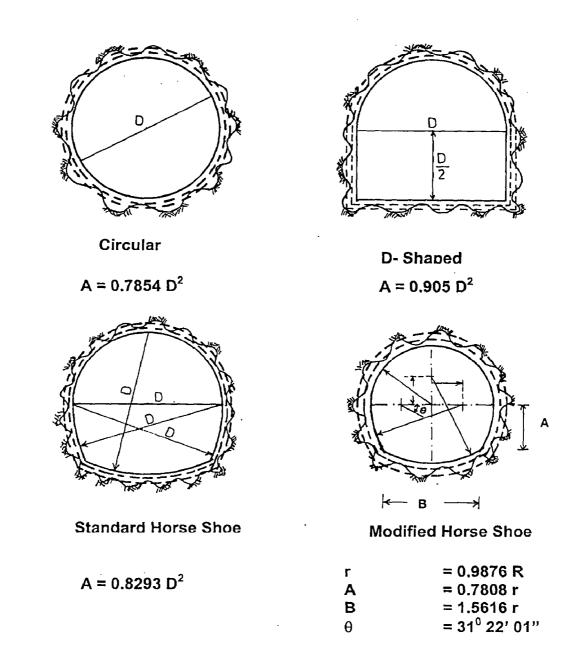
Different shapes of tunnel cross section generally adopted
